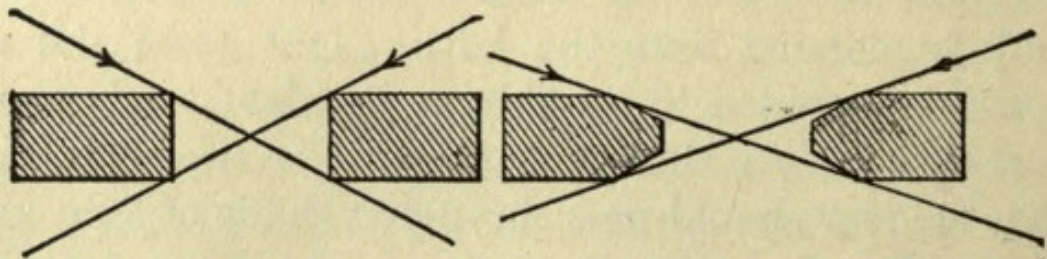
Beveled window pier. (Burgerstein, L., and Netolitzky, A., *Handbuch*, 218.)
